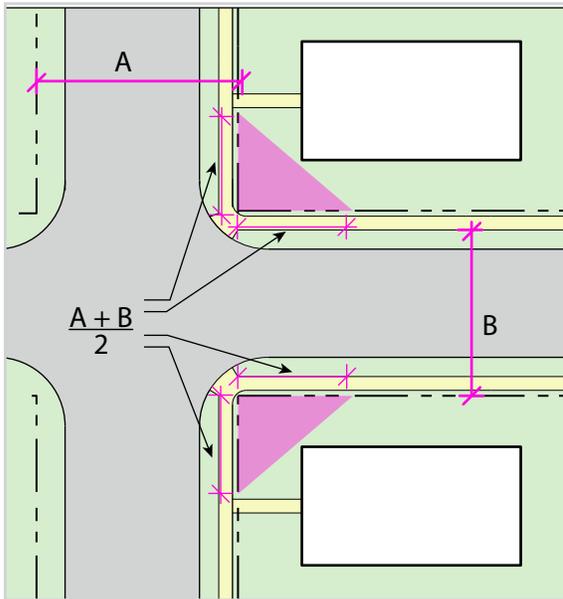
An illustration of the sight triangle on two corners of an intersection. Sight triangles are applicable on all four corners of a four-sided intersection.
